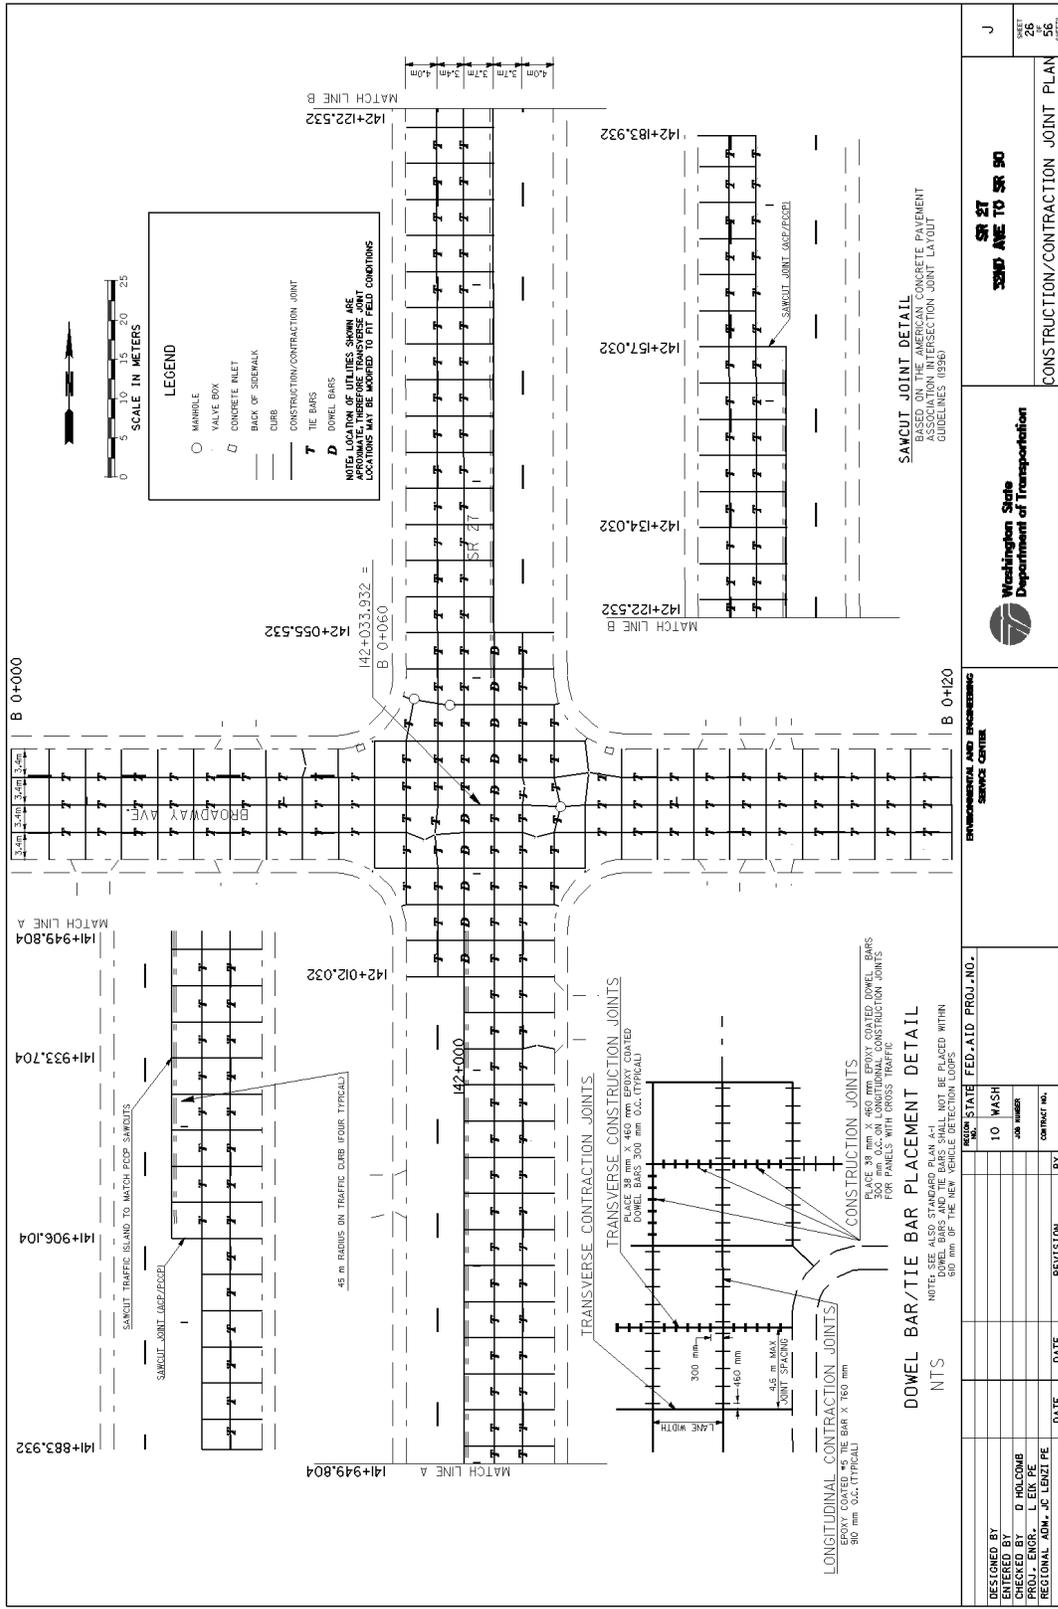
SR 27, Pines Road and Broadway Avenue – revised jointing plan.
